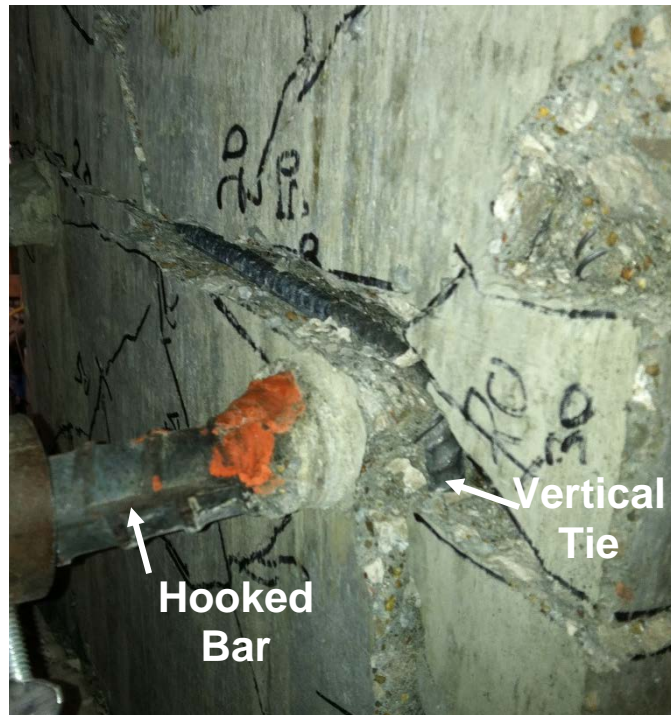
Vertical tie being pulled from the front of the column (Specimen 8-12-90-5#3vr-i-2.5-2-10 after failure)
